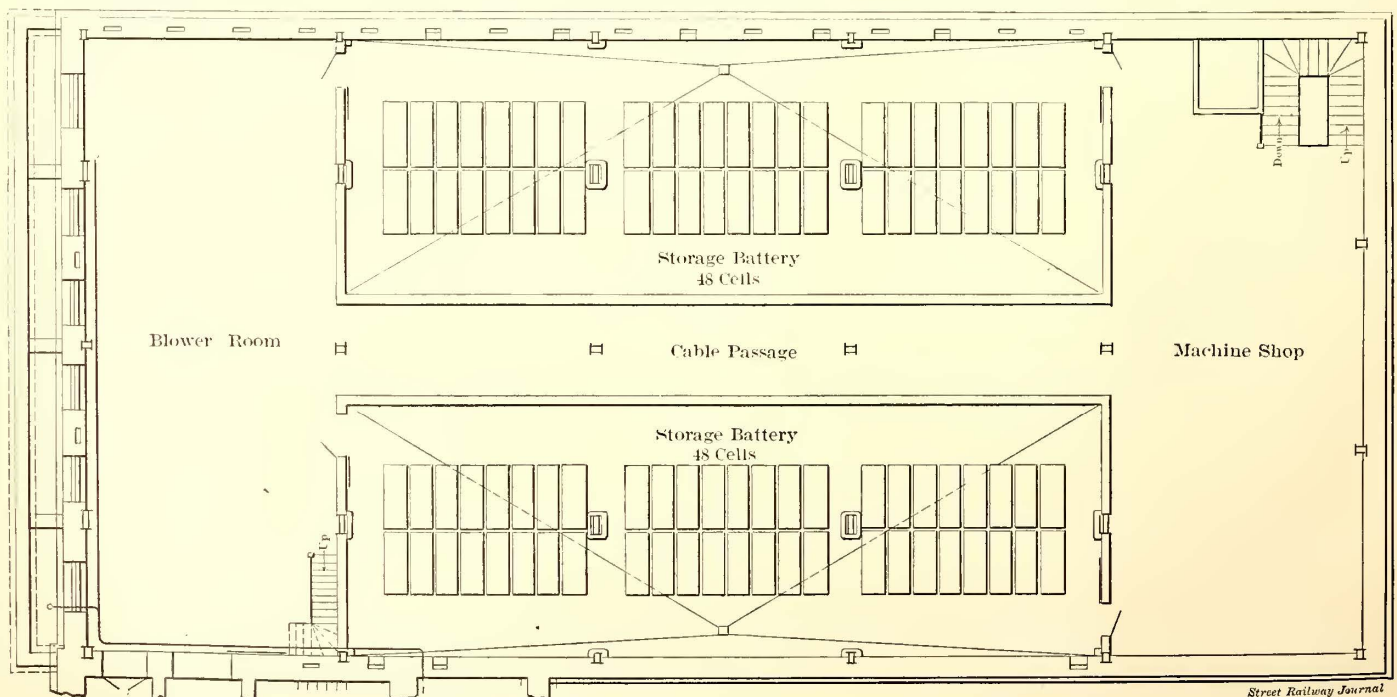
PLAN OF BASEMENT IN SUB-STATION NO. 4
